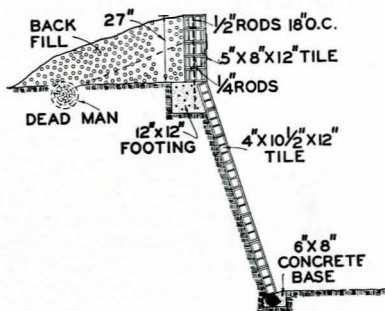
A 4-inch wall of 4"x 10½"x12" tile below grade and an 8-inch wall of 5"x8"x12" above.
